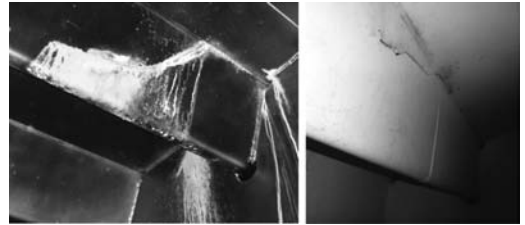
Fatigue cracks on the longitudinal ribs of the orthotropic plate of the A4-Peschiera Bridge.
